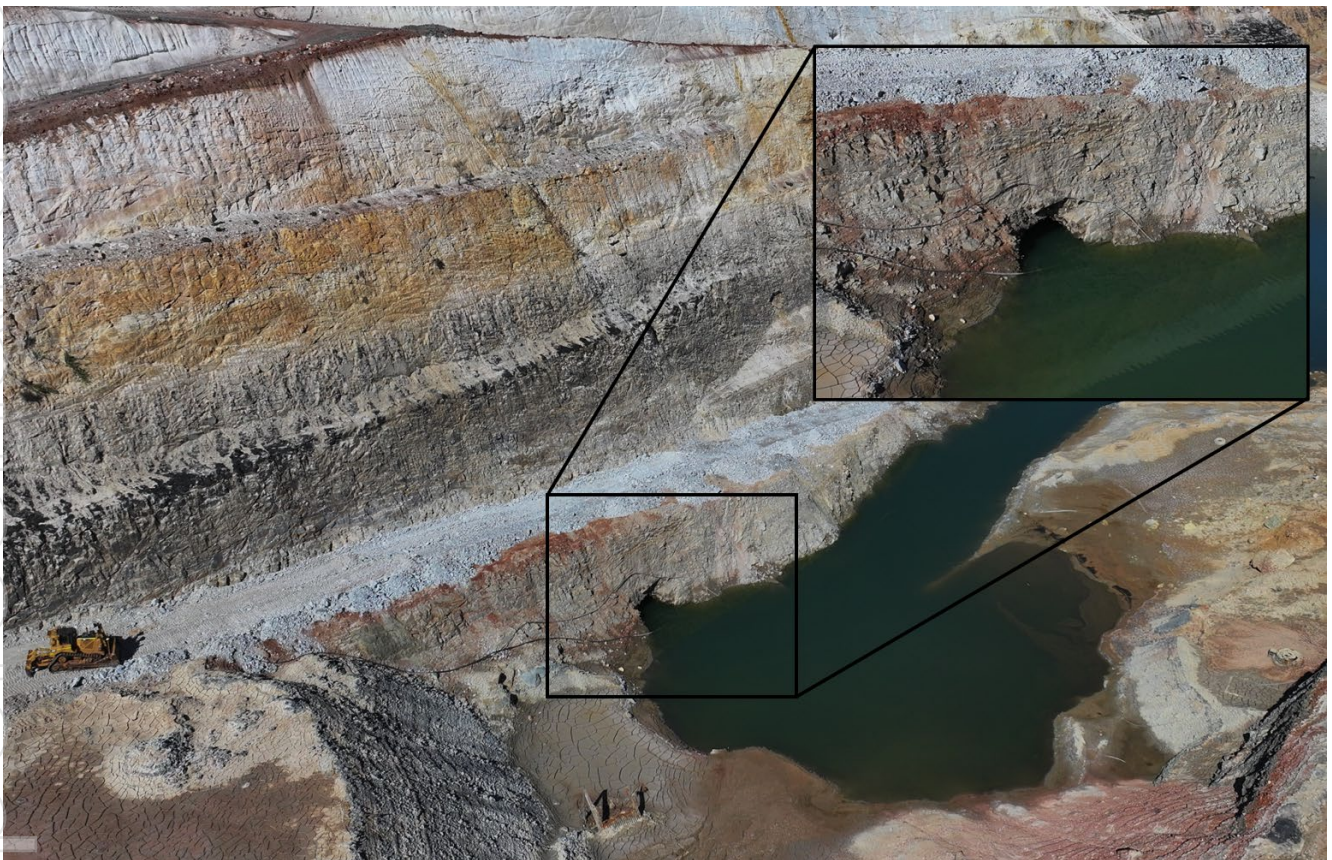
Youanmi Main pit dewatering and mine portal, looking south (18 April 2026)
